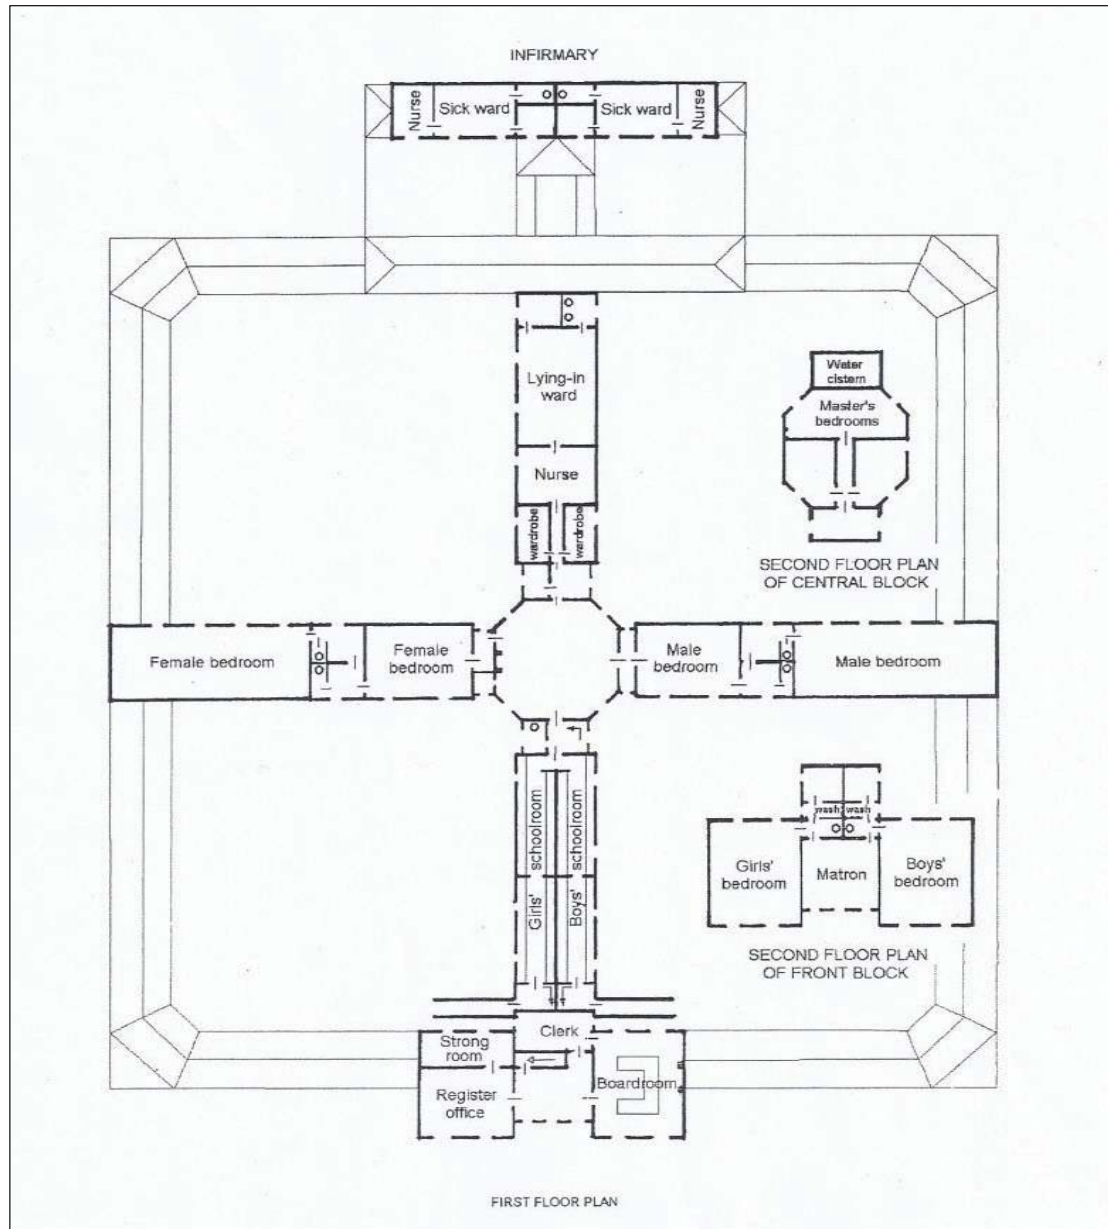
First Floor plans for Ludlow Union Workhouse by Matthew Stead, 1836 (after Sumbler, 2016)
